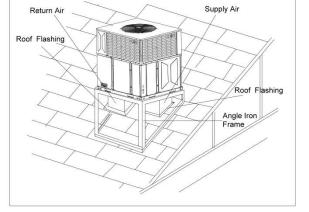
Rooftop Installation - Frame Mounting Note:
